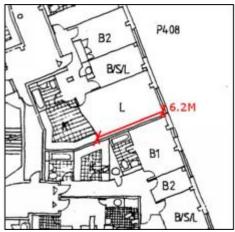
(above): Typical floor plan showing the depths of living rooms at 1-23 Gray's Inn Road.
